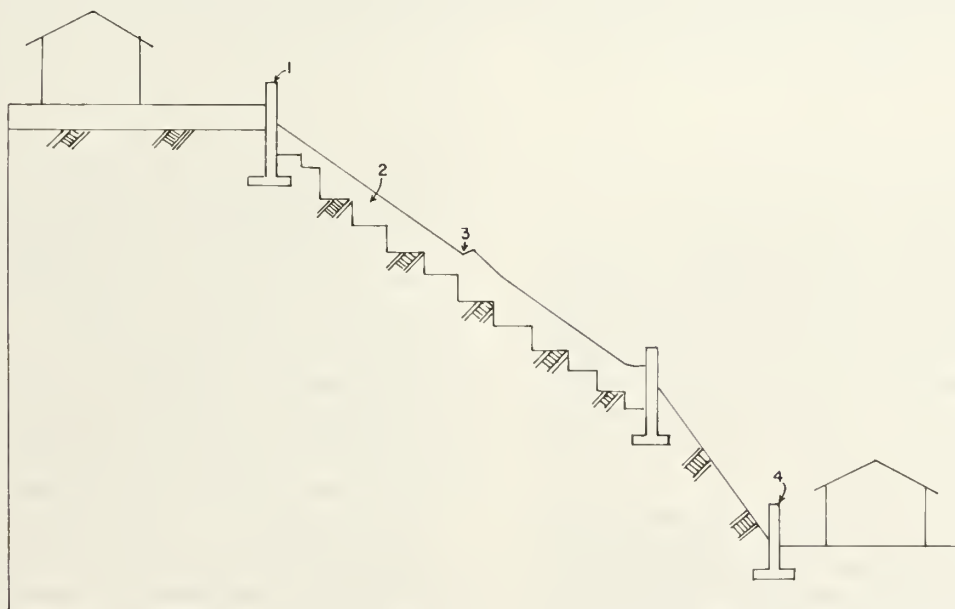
Diagrammatic cross section illustrating alternative remedial measures utilizing a revetment system and engineered fill to stabilize slopes in residential areas of the Baldwin Hills: (1) Properly designed retaining wall and drainage devices (such as granular backfill and drain pipe behind the wall and weep holes in the wall). (2) Loose soil and slide debris are removed, stabilization fill is then properly keyed and benched into firm bedrock as shown, and adequate subdrains should be provided. For steep slopes, soil-cement fill may be desirable. (3) Gunite or concrete bench drains that divert water to discharge outlet are constructed. (4) Retaining wall with adequate freeboard and a drainage device to prevent downhill earth movement and water/mud damage to property are constructed. (Not drawn to scale.)
